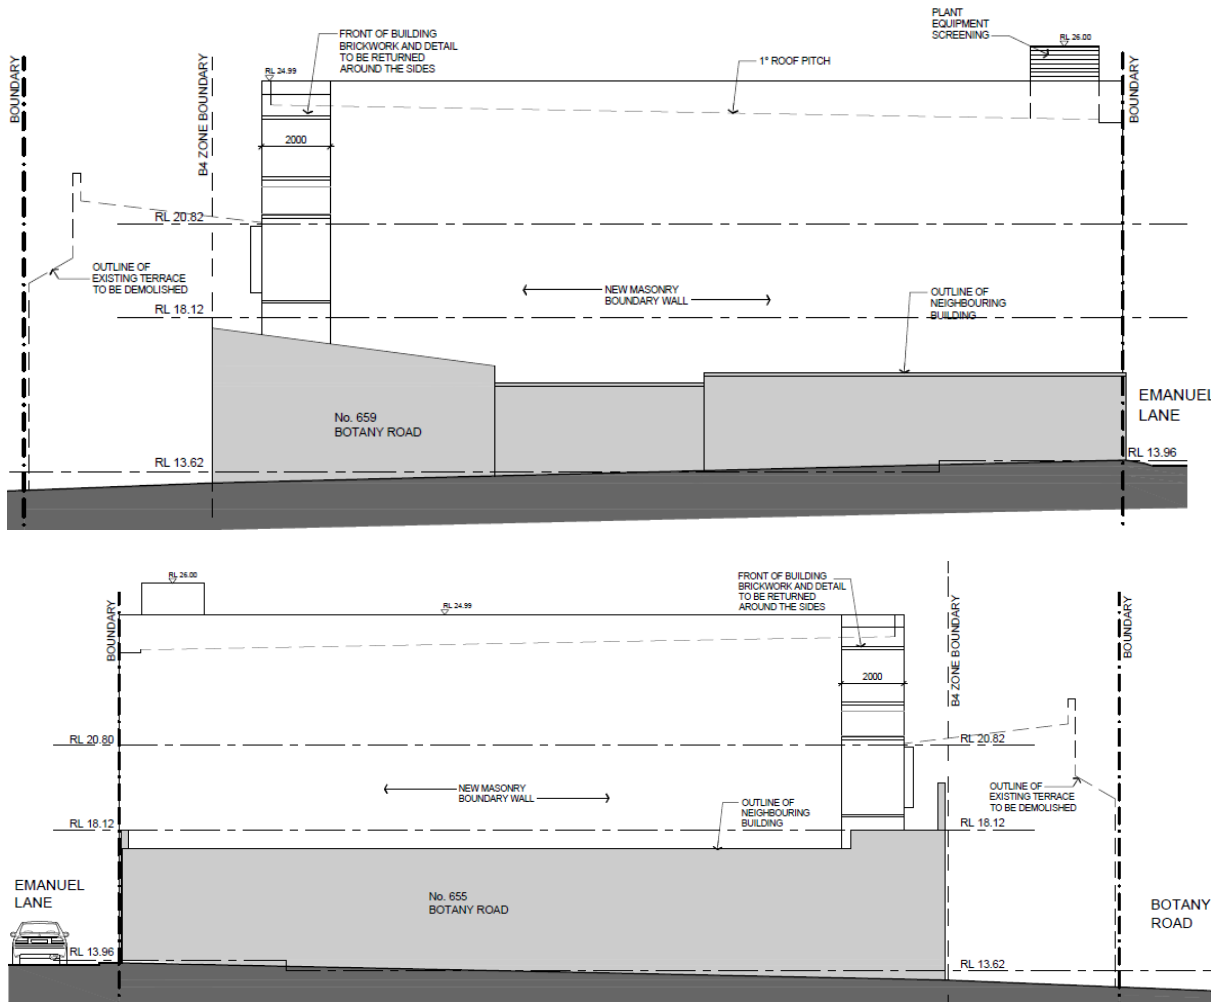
Proposed South (top) and North (bottom) Elevation Plans
